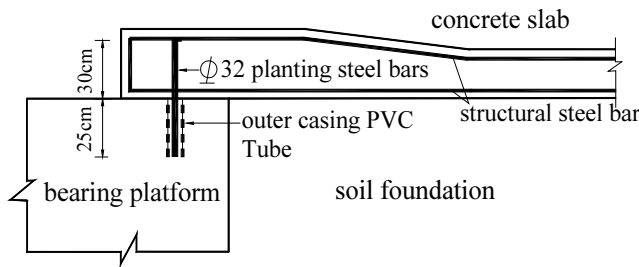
The schematic diagram of planting steel bar into bearing platform
